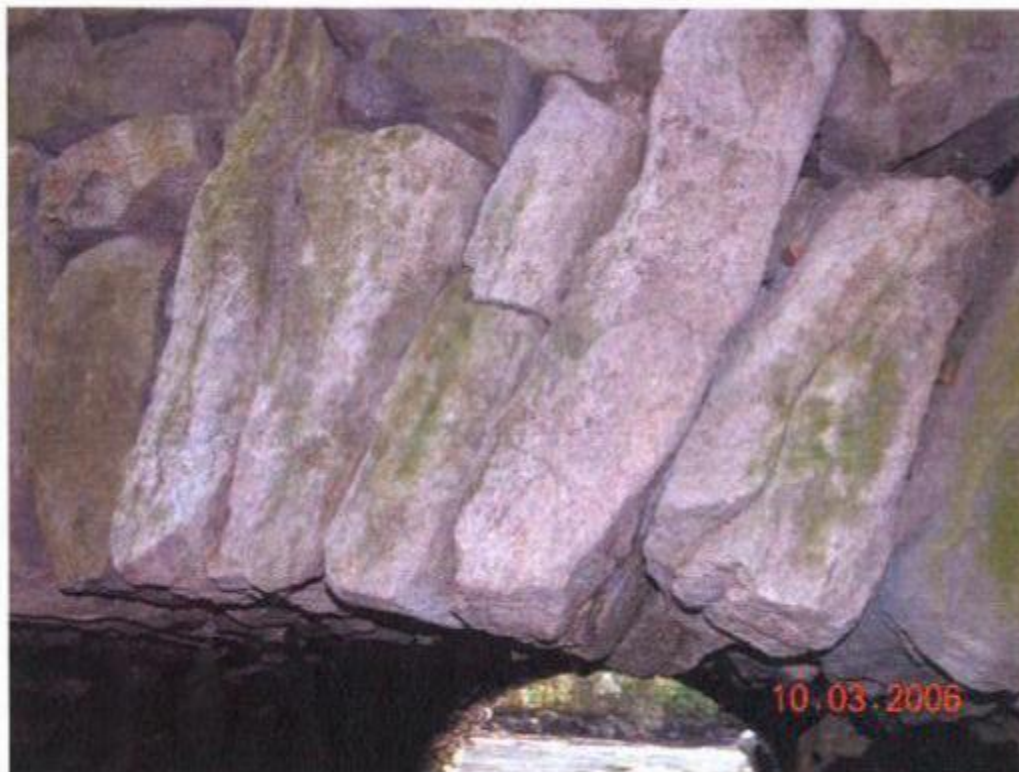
West arch, north arch ring: Cracks in two stones appear unchanged
